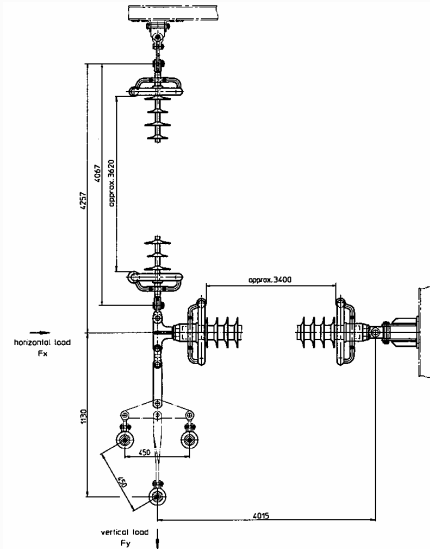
Draft for Light Load Condition-Arrangement 2
